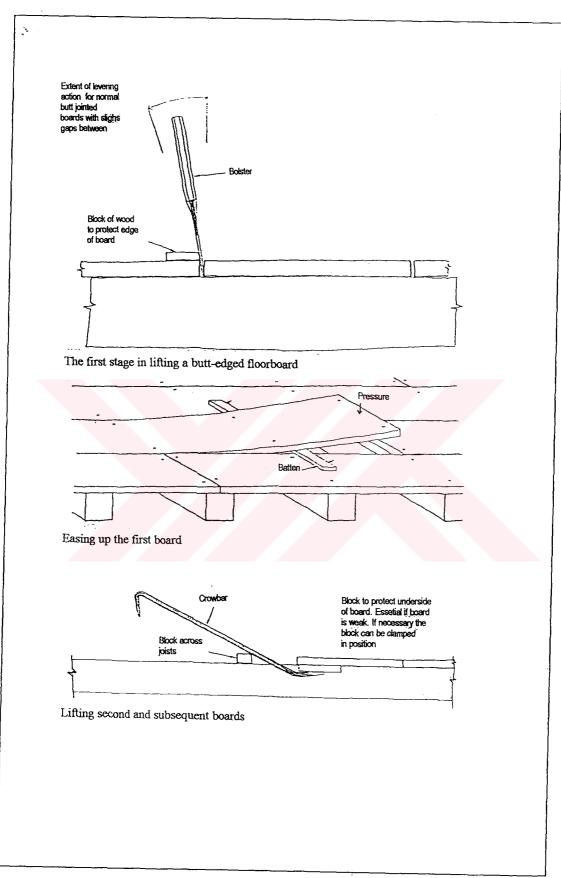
Lifting of Floor Boards (Hughes, P., 1988)
